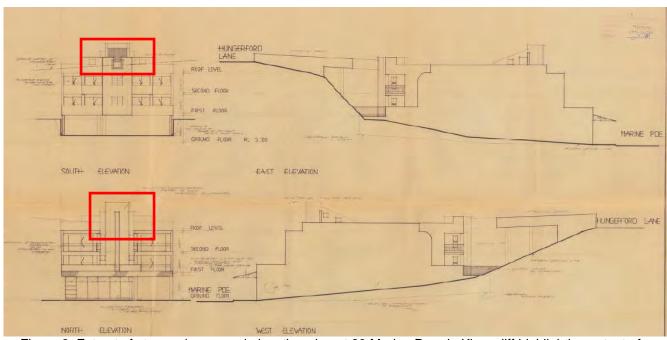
Extract of stamped approved elevation plan at 28 Marine Parade Kingscliff highlighting extent of variation to building height approved by Council
